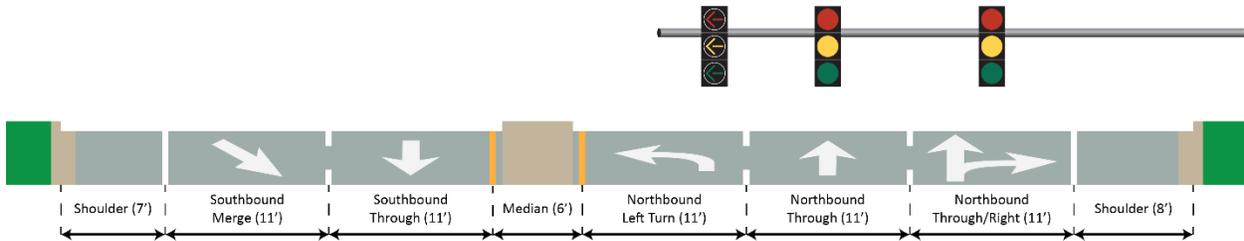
Existing Typical Section, St. Andrews Church Rd south of FDR Blvd
